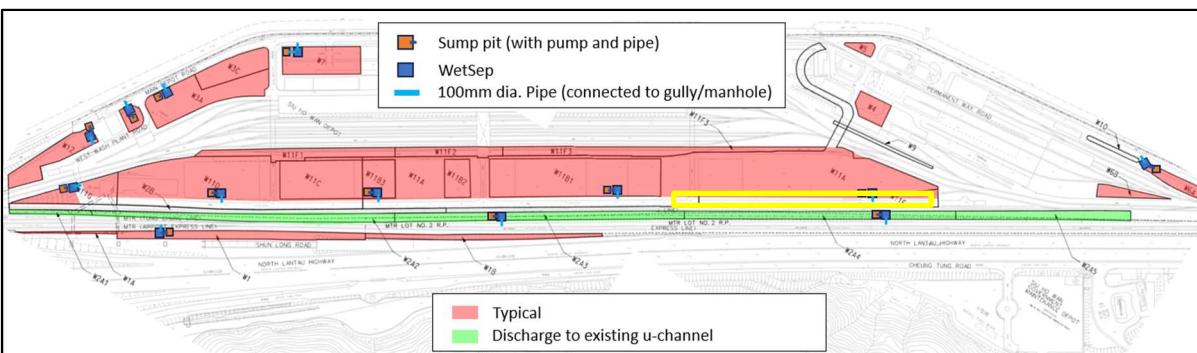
Overall Temporary Drainage Arrangement Layout
